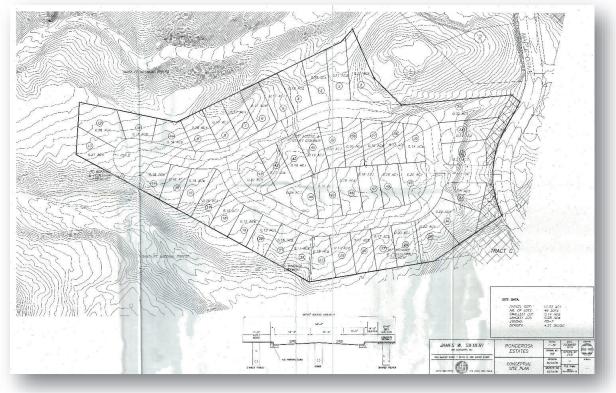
Ponderosa Estates, Phase 3 Sketch Plan
